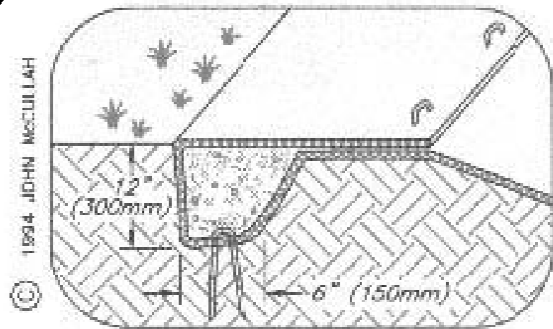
LONGITUDINAL ANCHOR TRENCH
